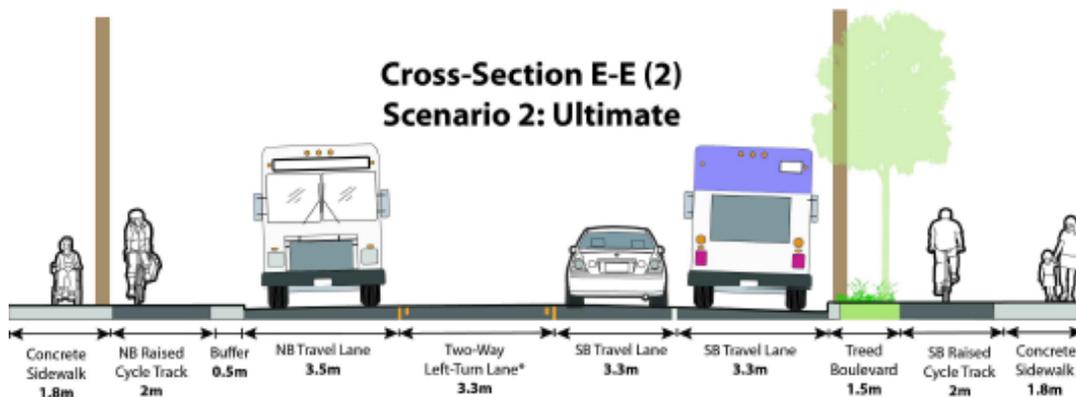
Example cross-section of “Ultimate” design between Williams Lake Road and Dentith Road
